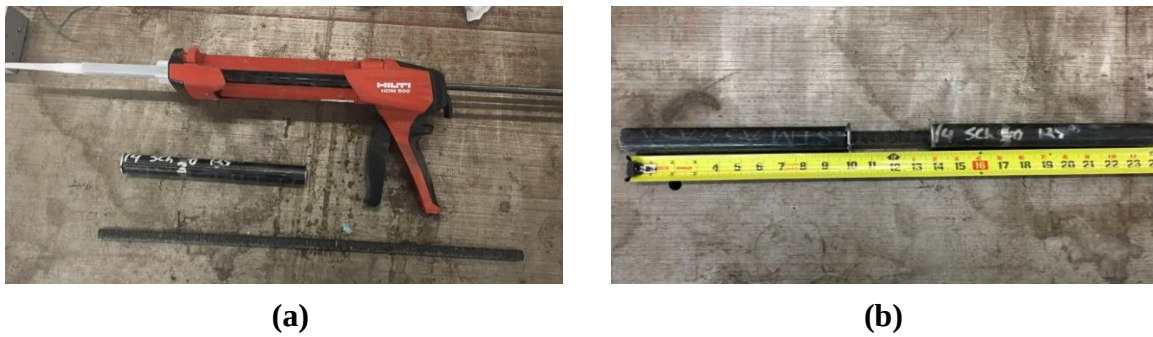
Epoxy anchoring components (a) and completed anchorage system (b)
